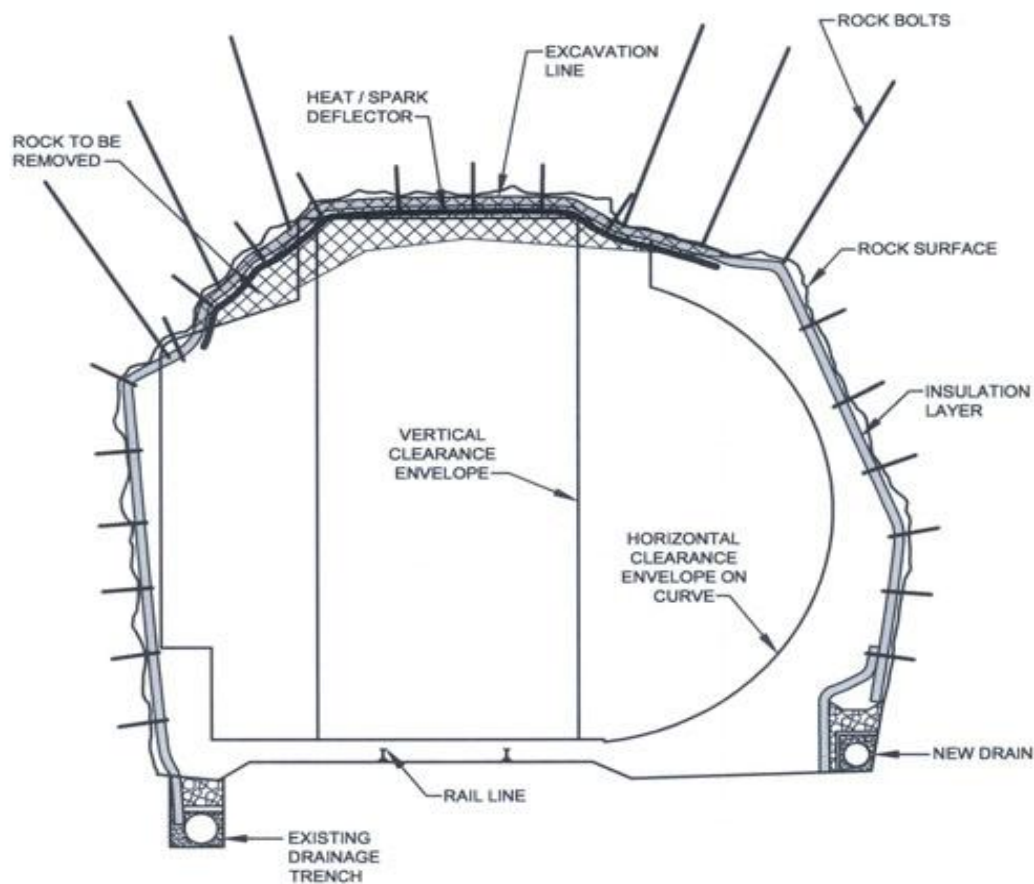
Rockport Tunnel Typical Clearance Improvement & Stabilization
